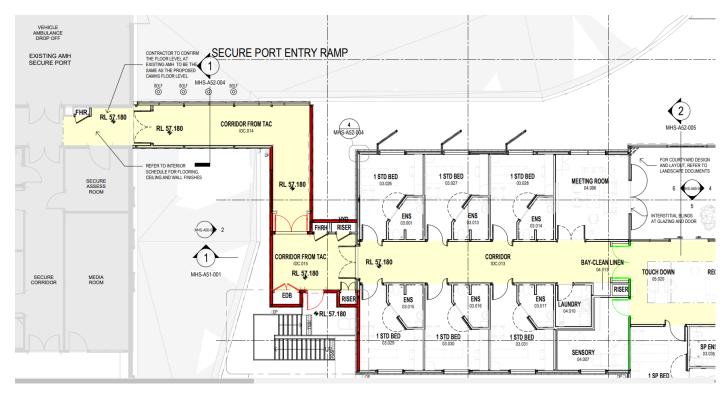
CAMHS connection to existing Mental Health Building (STH)
